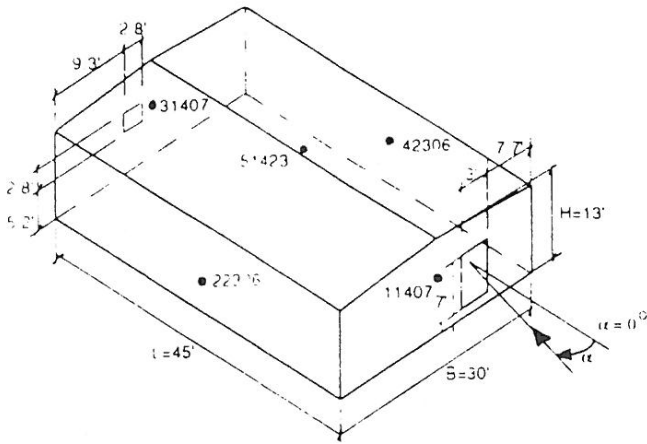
Wall openings and pressure tap locations •, on the full scale low-rise WERFL test building.
